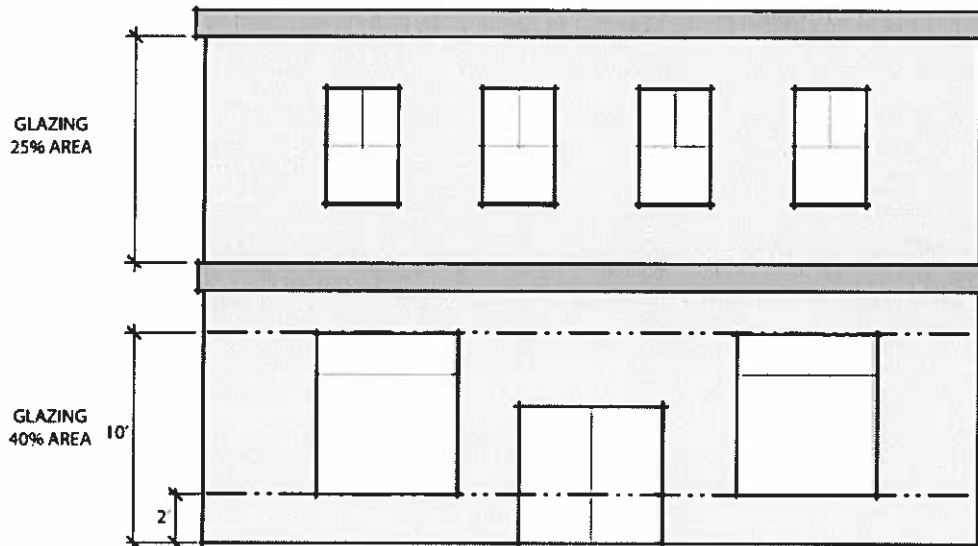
Commercial or mixed use building meeting glazing requirements
